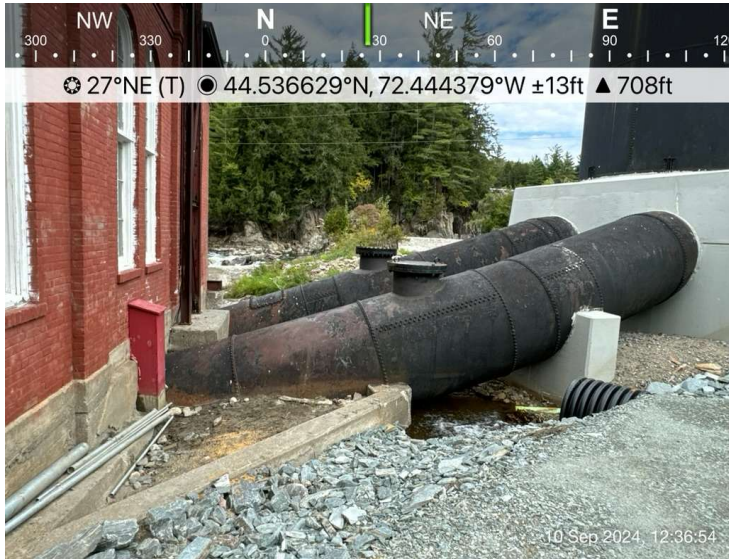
Exterior penstock building entry to turbine below the first floor slab. Surge tower at right in photo.
